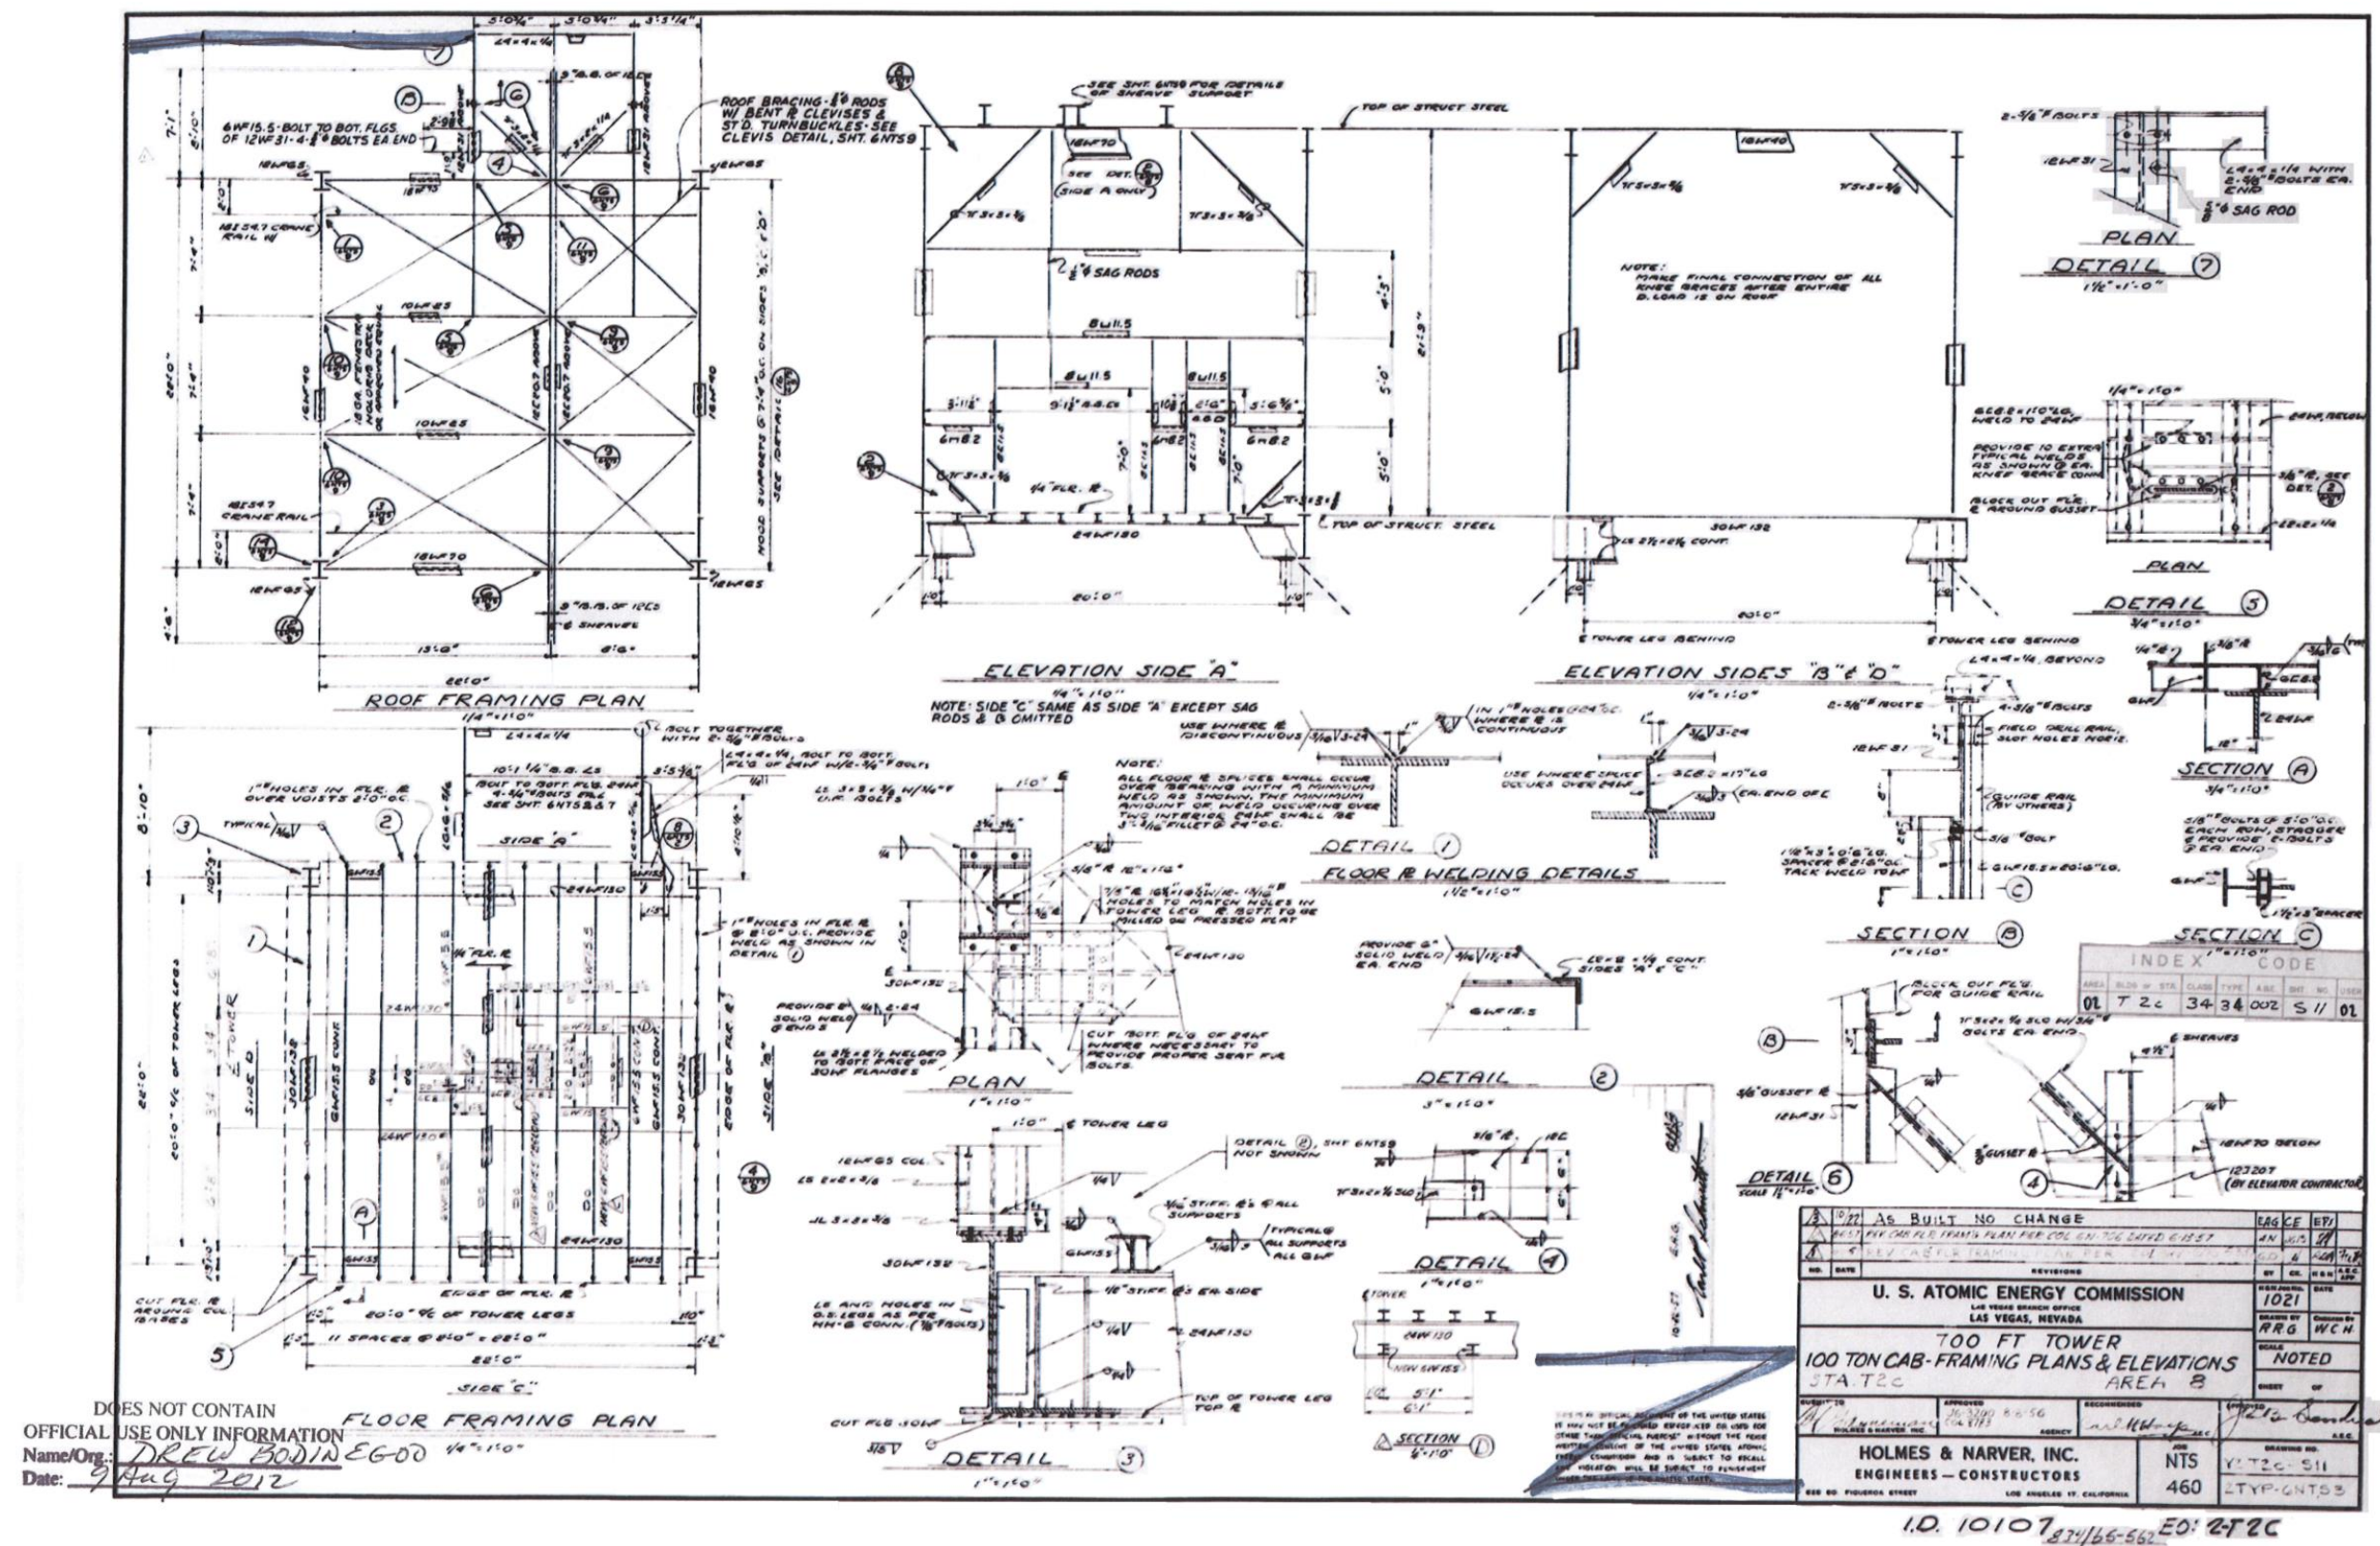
Smoky 700 ft tower, 100 ton cab framing plans and elevations.
